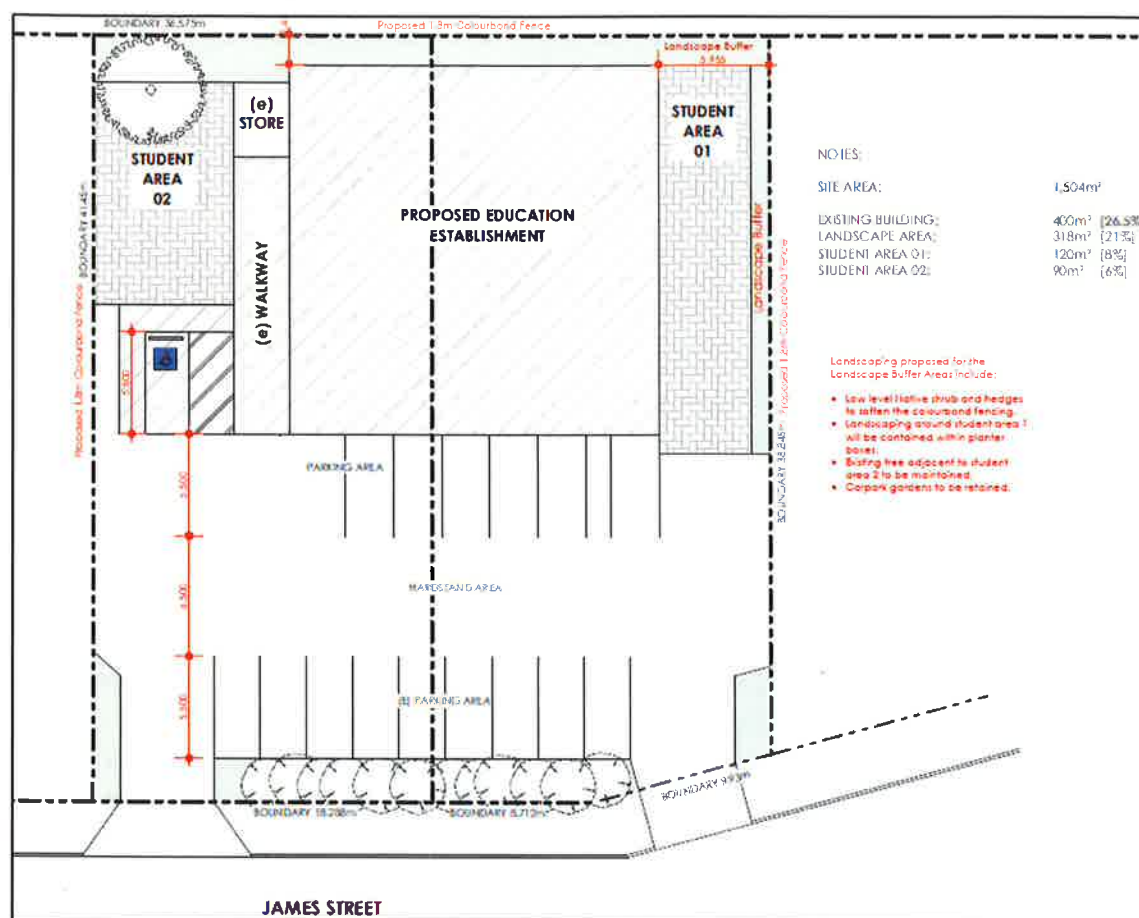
| Proposed Landscaping and Fencing Plan (Source: Applicant's RtS)
